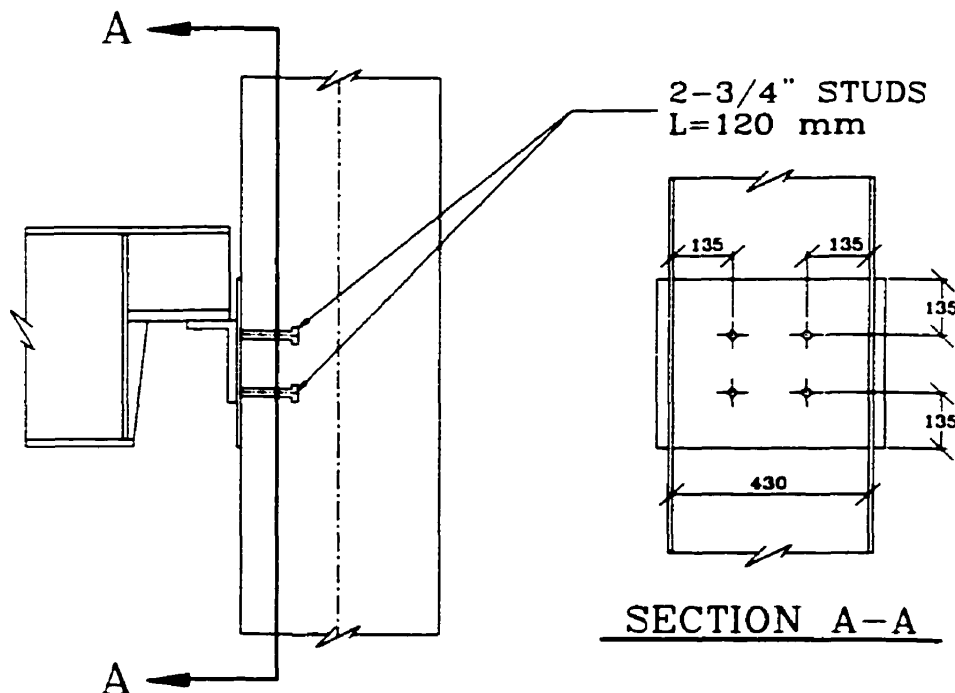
Shear Stud Layout in Specimen C18-Seat-Anchorage
